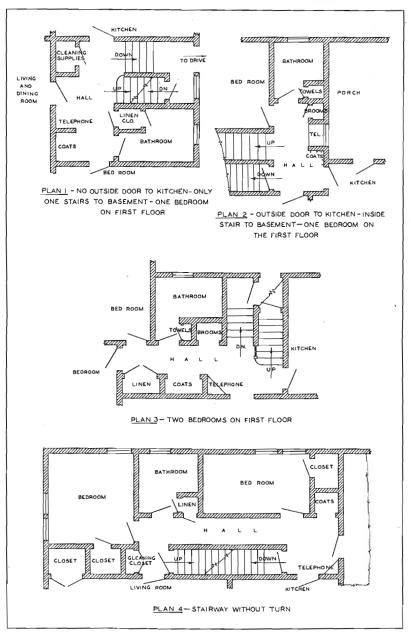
Plate VIII. Floor plans for halls connecting parts of house. See discussion on page 36.
